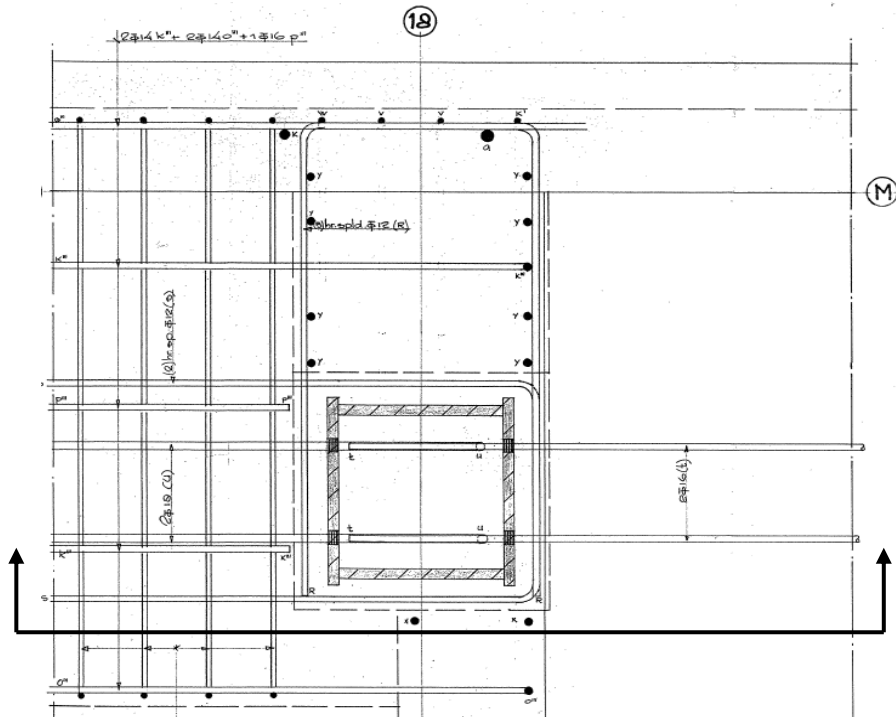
Typical Corner Column Plan (TUD FMD)
